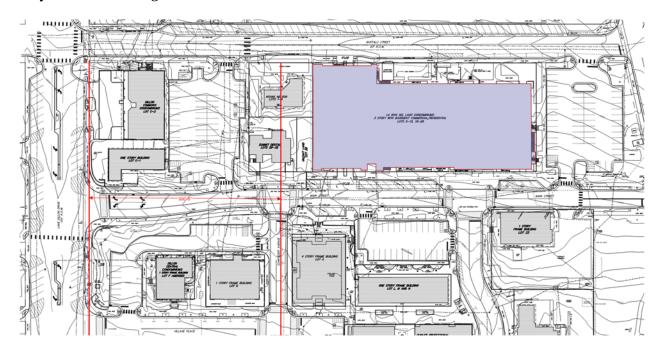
135 Main Street beyond 300-feet from Lake Dillon Drive and nearby parking
